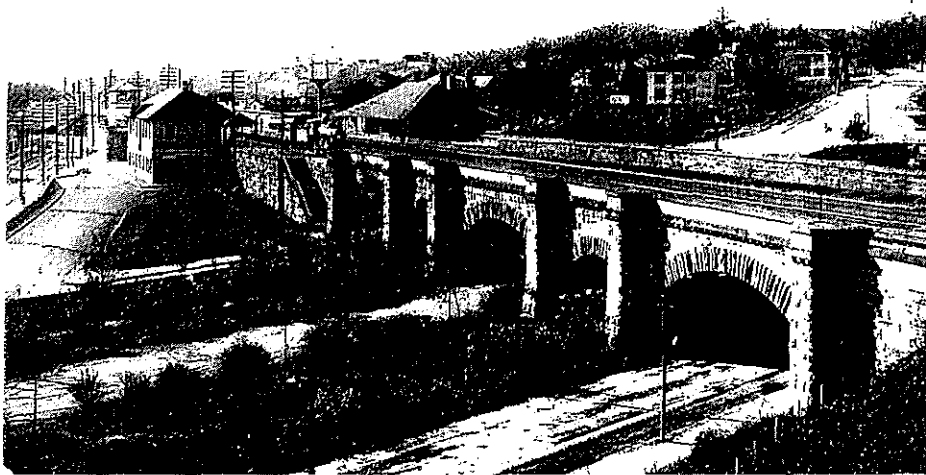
Forest Hill Station with Parkway, Landscaping, Lighting and Viaduct, July 1919, SPNEA.
